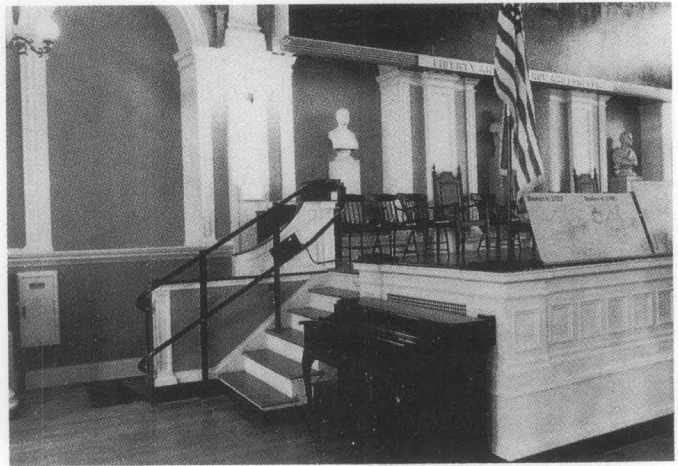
Inclined lifts can sometimes overcome interior changes of elevation where space is limited. This lift in Boston's Faneuil Hall created access to the floor and stage level of the State Room. Photo: Paul Holtz.
